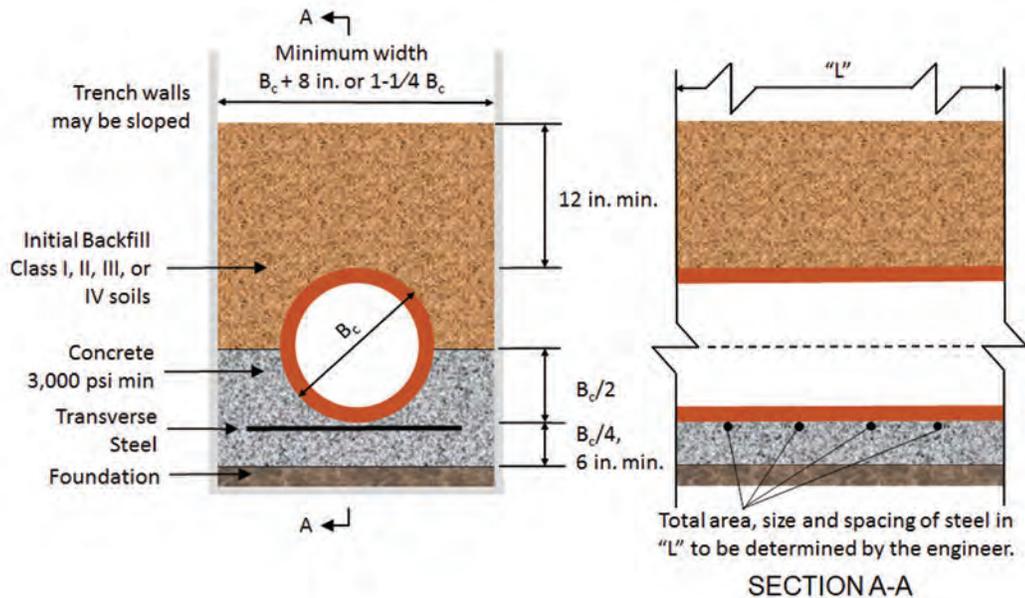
Concrete Cradle Bedding – Load Factor = 3.4
